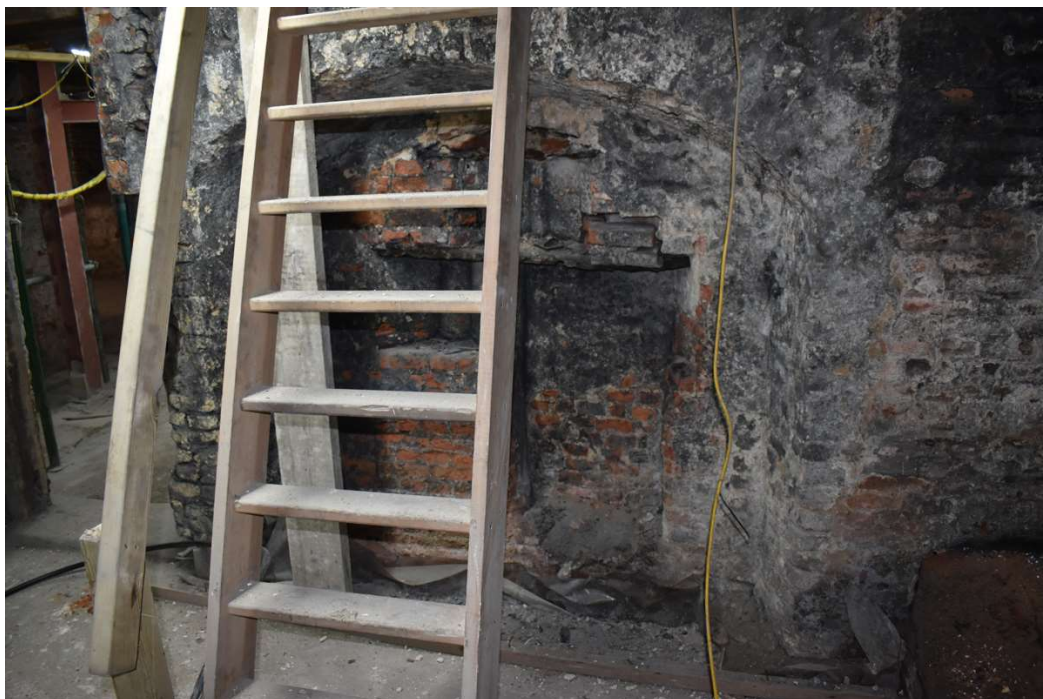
Inserted brick staircase in eastern wall of bay 4, looking east.
